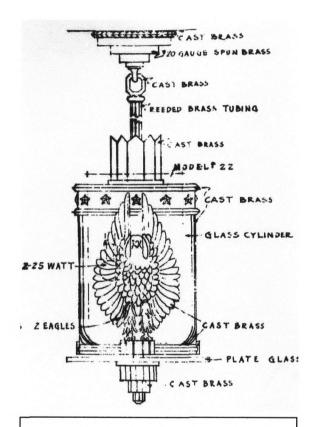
(Above) Architect's drawing of front entrance vestibule chandelier. (Taken from plan sheet T-213)
